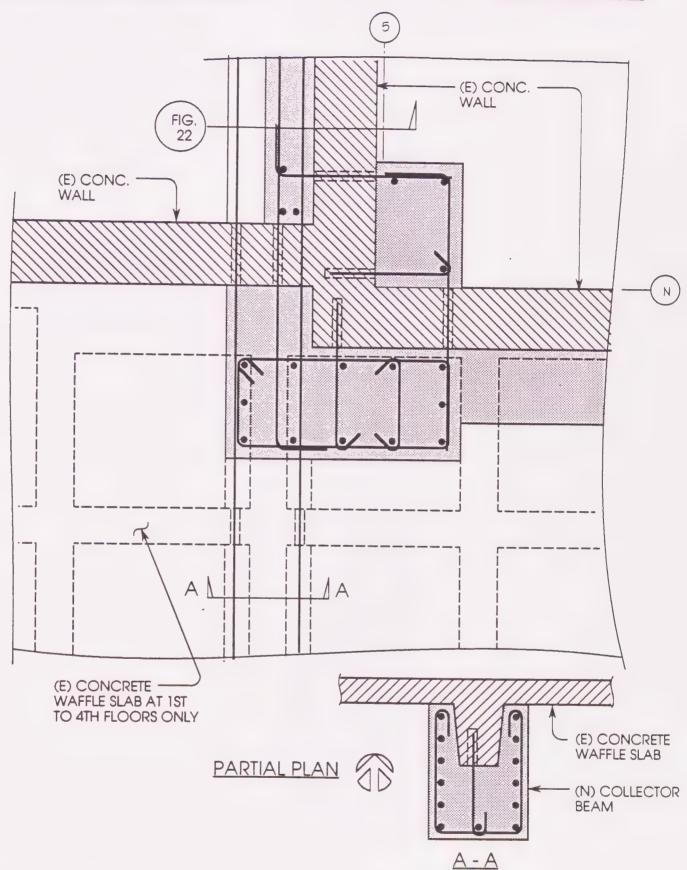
Retrofit Scheme - Column at Southeast Corner of Tower
